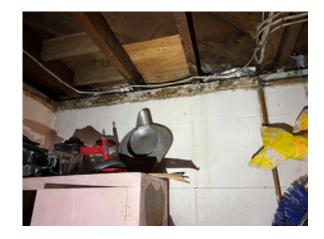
Water-Damaged Insulation and Water Marks Running Down the Concrete Basement Wall.
